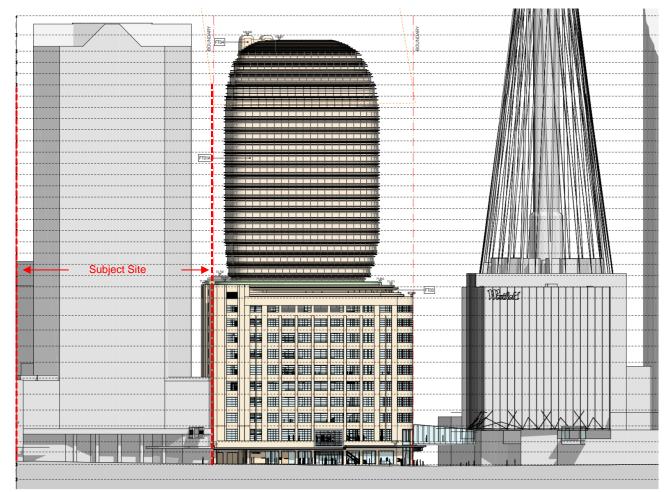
Extract of approved building under D/2019/263– Castlereagh Street elevation (showing the subject site indicated in red)
